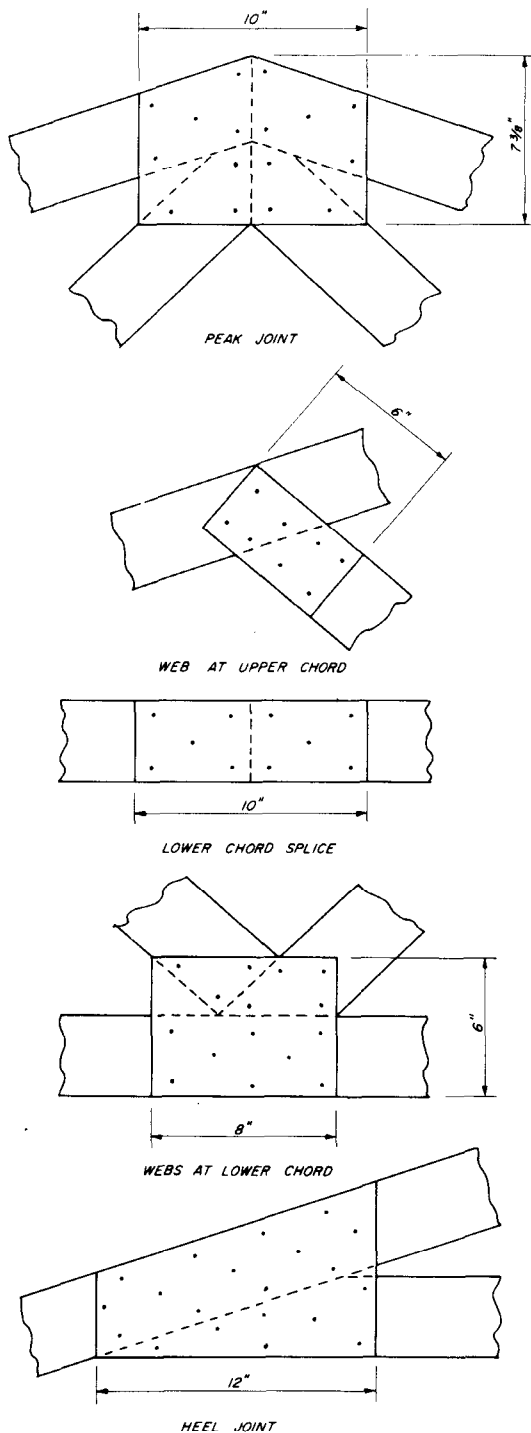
Joint details for all nail-glued trussed rafters. All gussets were 1/2-inch, exterior grade, Douglas-fir plywood. Grain direction ran the long dimension of the gusset. Fourpenny common nails were used to apply pressure. Glues were: (1) Casein, (2) phenol-resorcinol "A," and (3) phenol-resorcinol "B." (M 134834)
